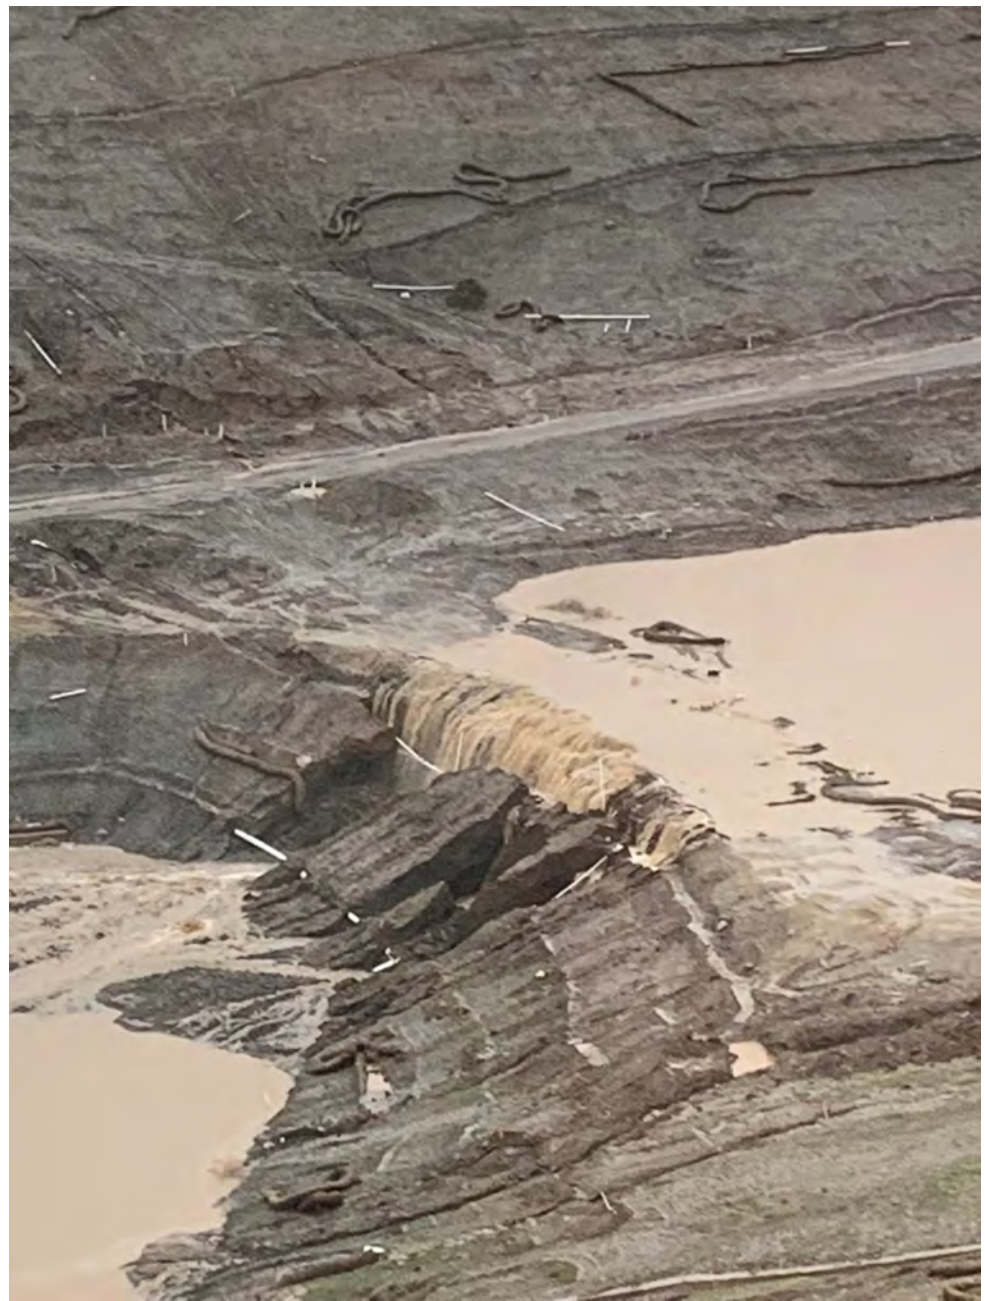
Looking west at the berm between Basin 8 and Basin 9, taken during the December storms. A period of intense rainfall resulted in a washout on the slope of the berm.
